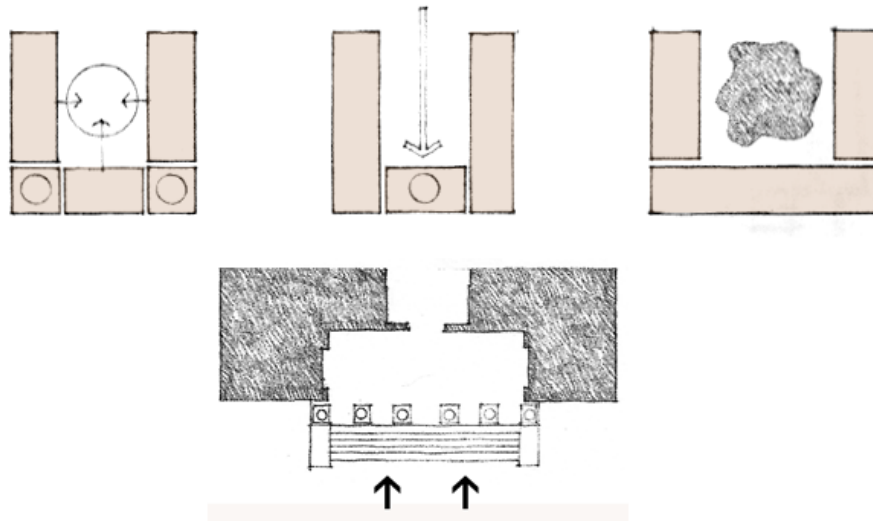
Ching sketches the theory behind a U-shaped floor plan
